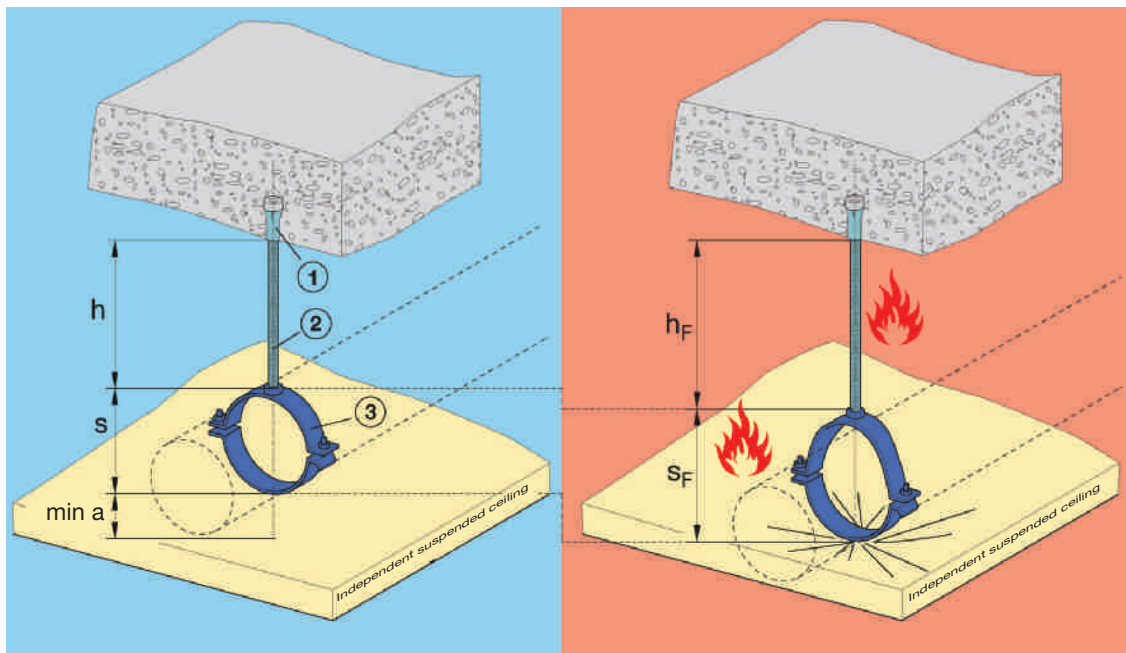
Pipe fastenings above an independent suspended ceiling in the event of fire / Sikla
